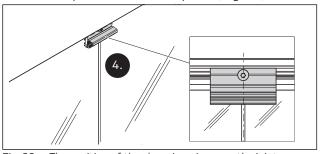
The position of the clamping pieces on the joint between the overpanel and a side panel
